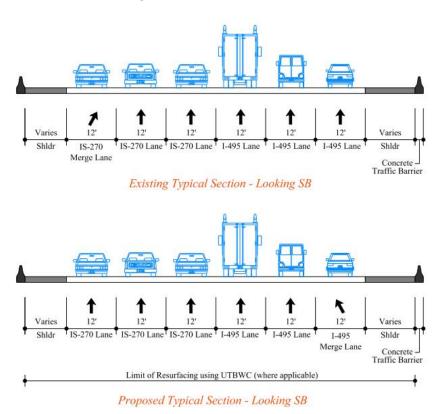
Location 5A Existing and Proposed Typical Sections IS-270 Spur to I-495 OL
